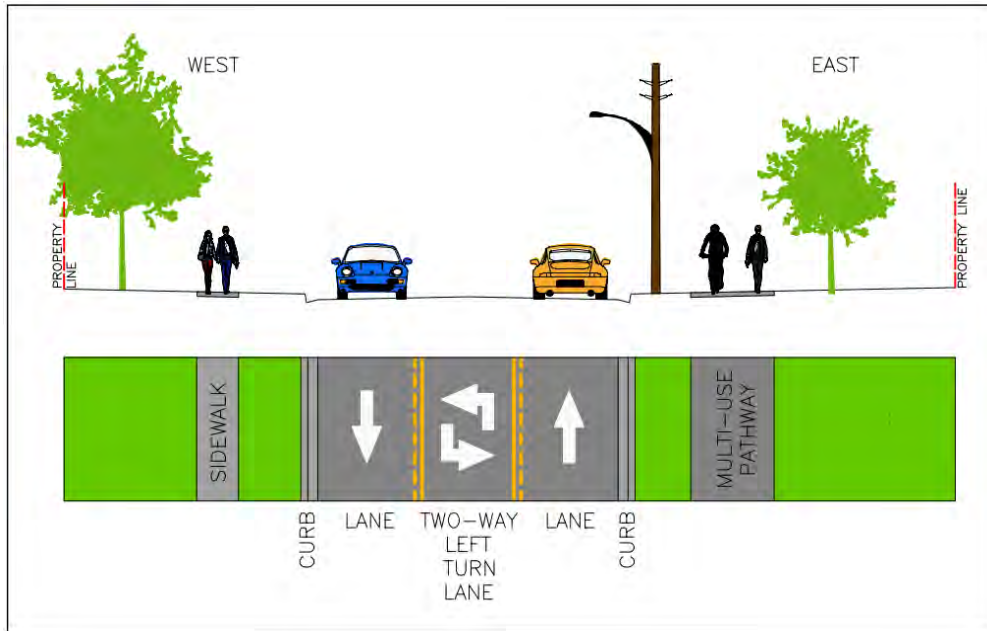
Option 3 – Sidewalk on one side of the road and multi-use pathway (accommodating two directions of travel) on other side of the road
